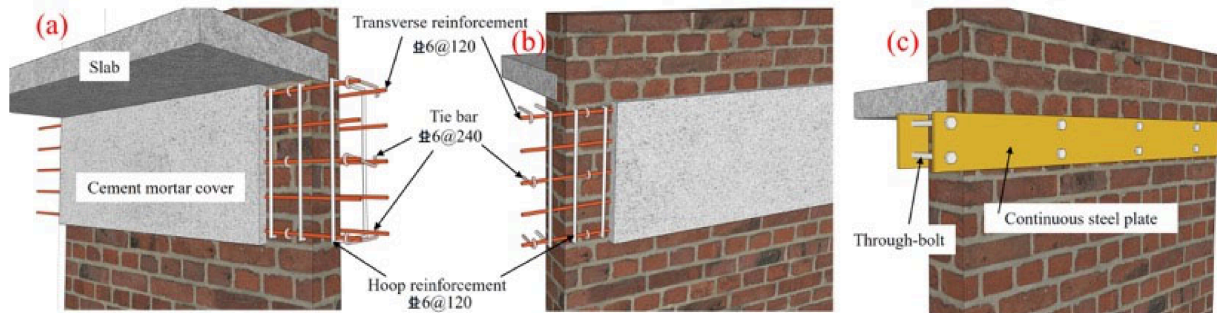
Construction diagram for installing ring beams. (a) Retrofitting with reinforced concrete ring beams on both sides. (b) Retrofitting with reinforced concrete ring beams on one side. (c) Steel plate reinforcement. Note: The brick texture displayed on the walls in all diagrams in Section 7 is solely a visualization effect of the 3D model material, used to differentiate different components, and does not reflect the actual masonry layout or mortar joint structure in the engineering project.
